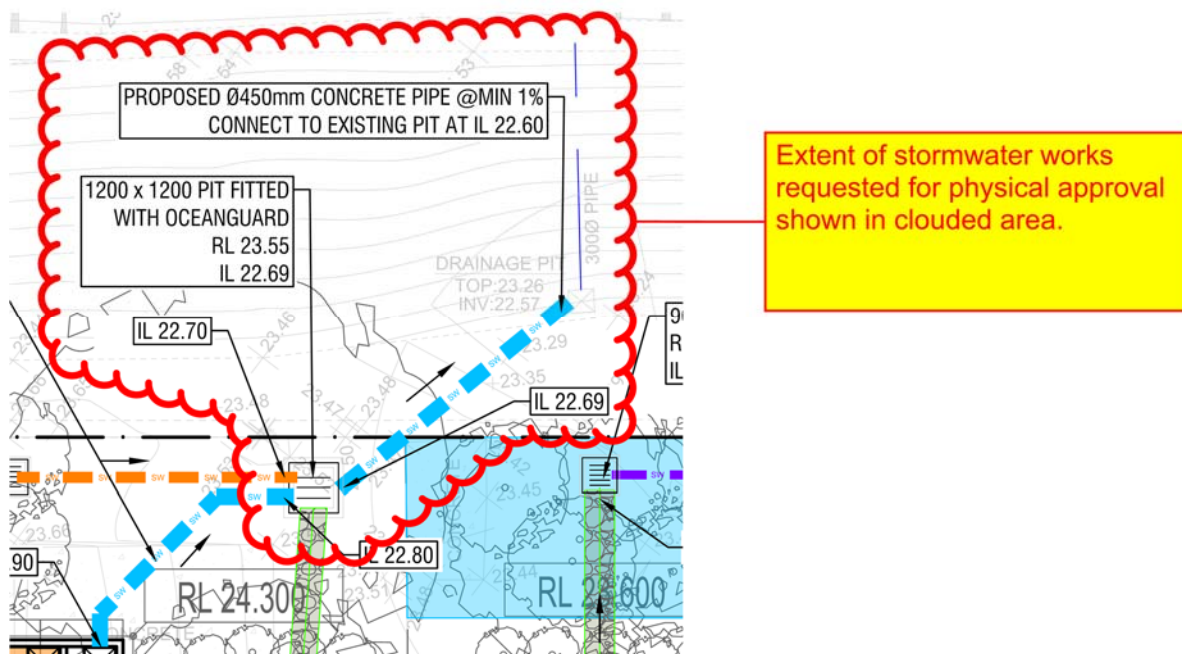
Extract from Stormwater and Civil Drawings – Ground Level, Lot 14.
